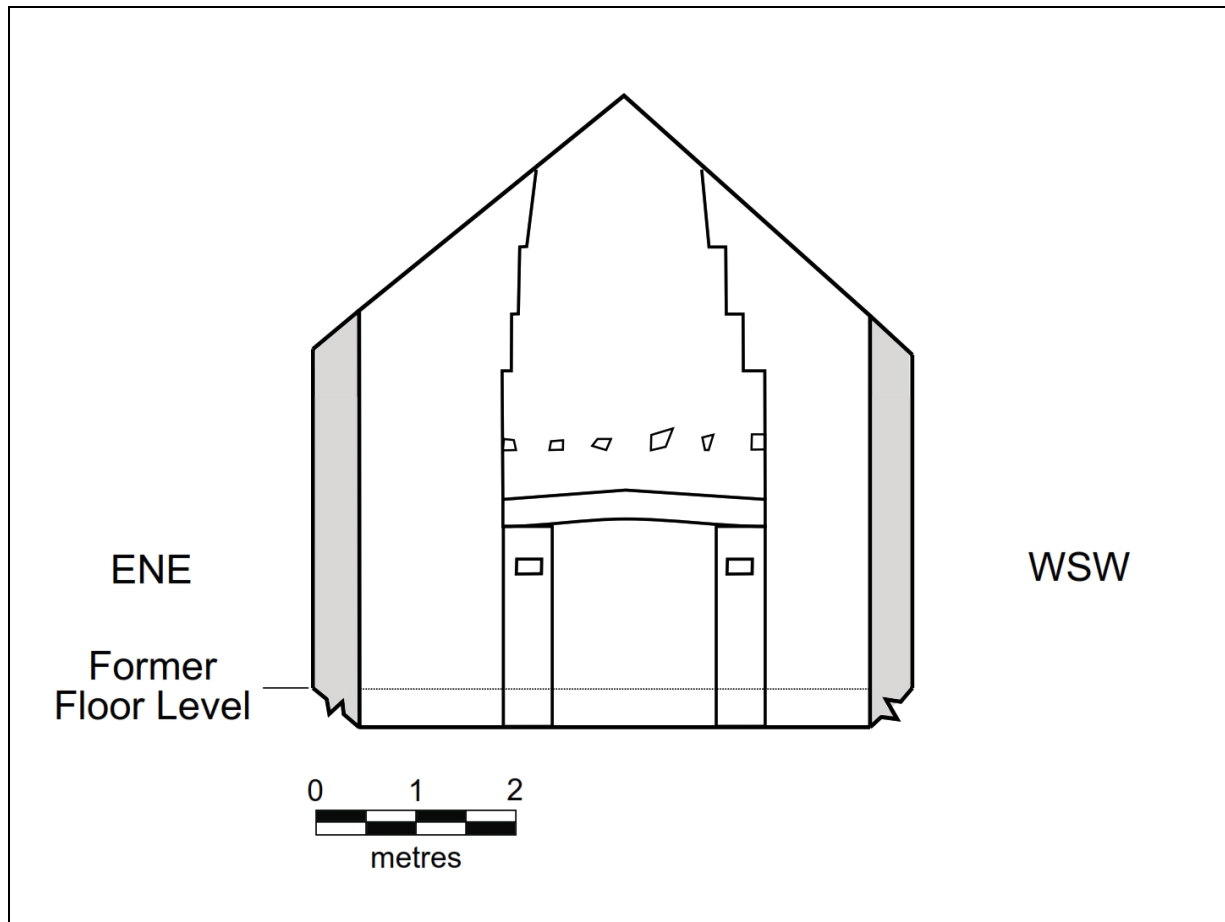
Elevation of inside of south gable wall, Yew Tree Barn, showing the chimney and fireplace.
